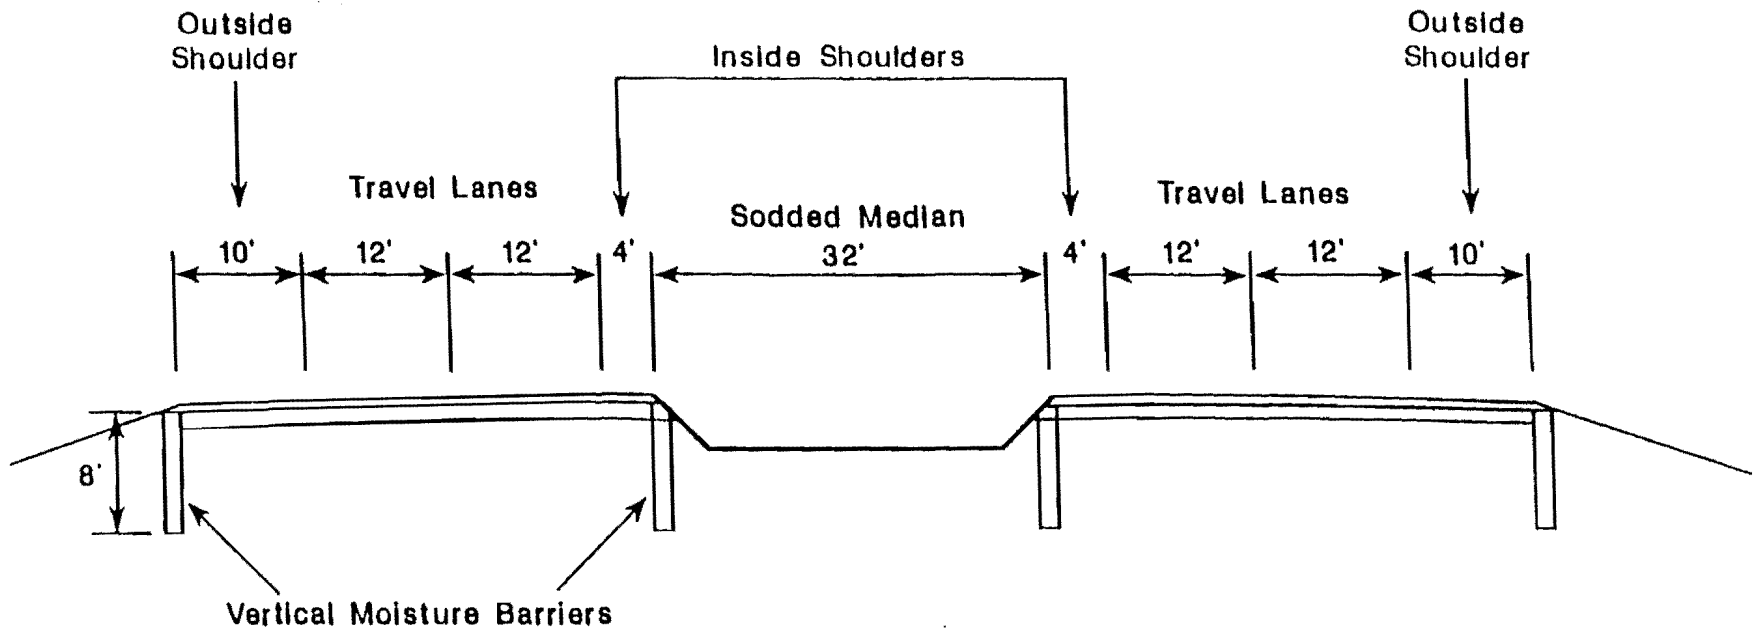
A Typical Cross Section of a Pavement with Vertical Moisture Barriers (Jayatilaka et al. 1993).
